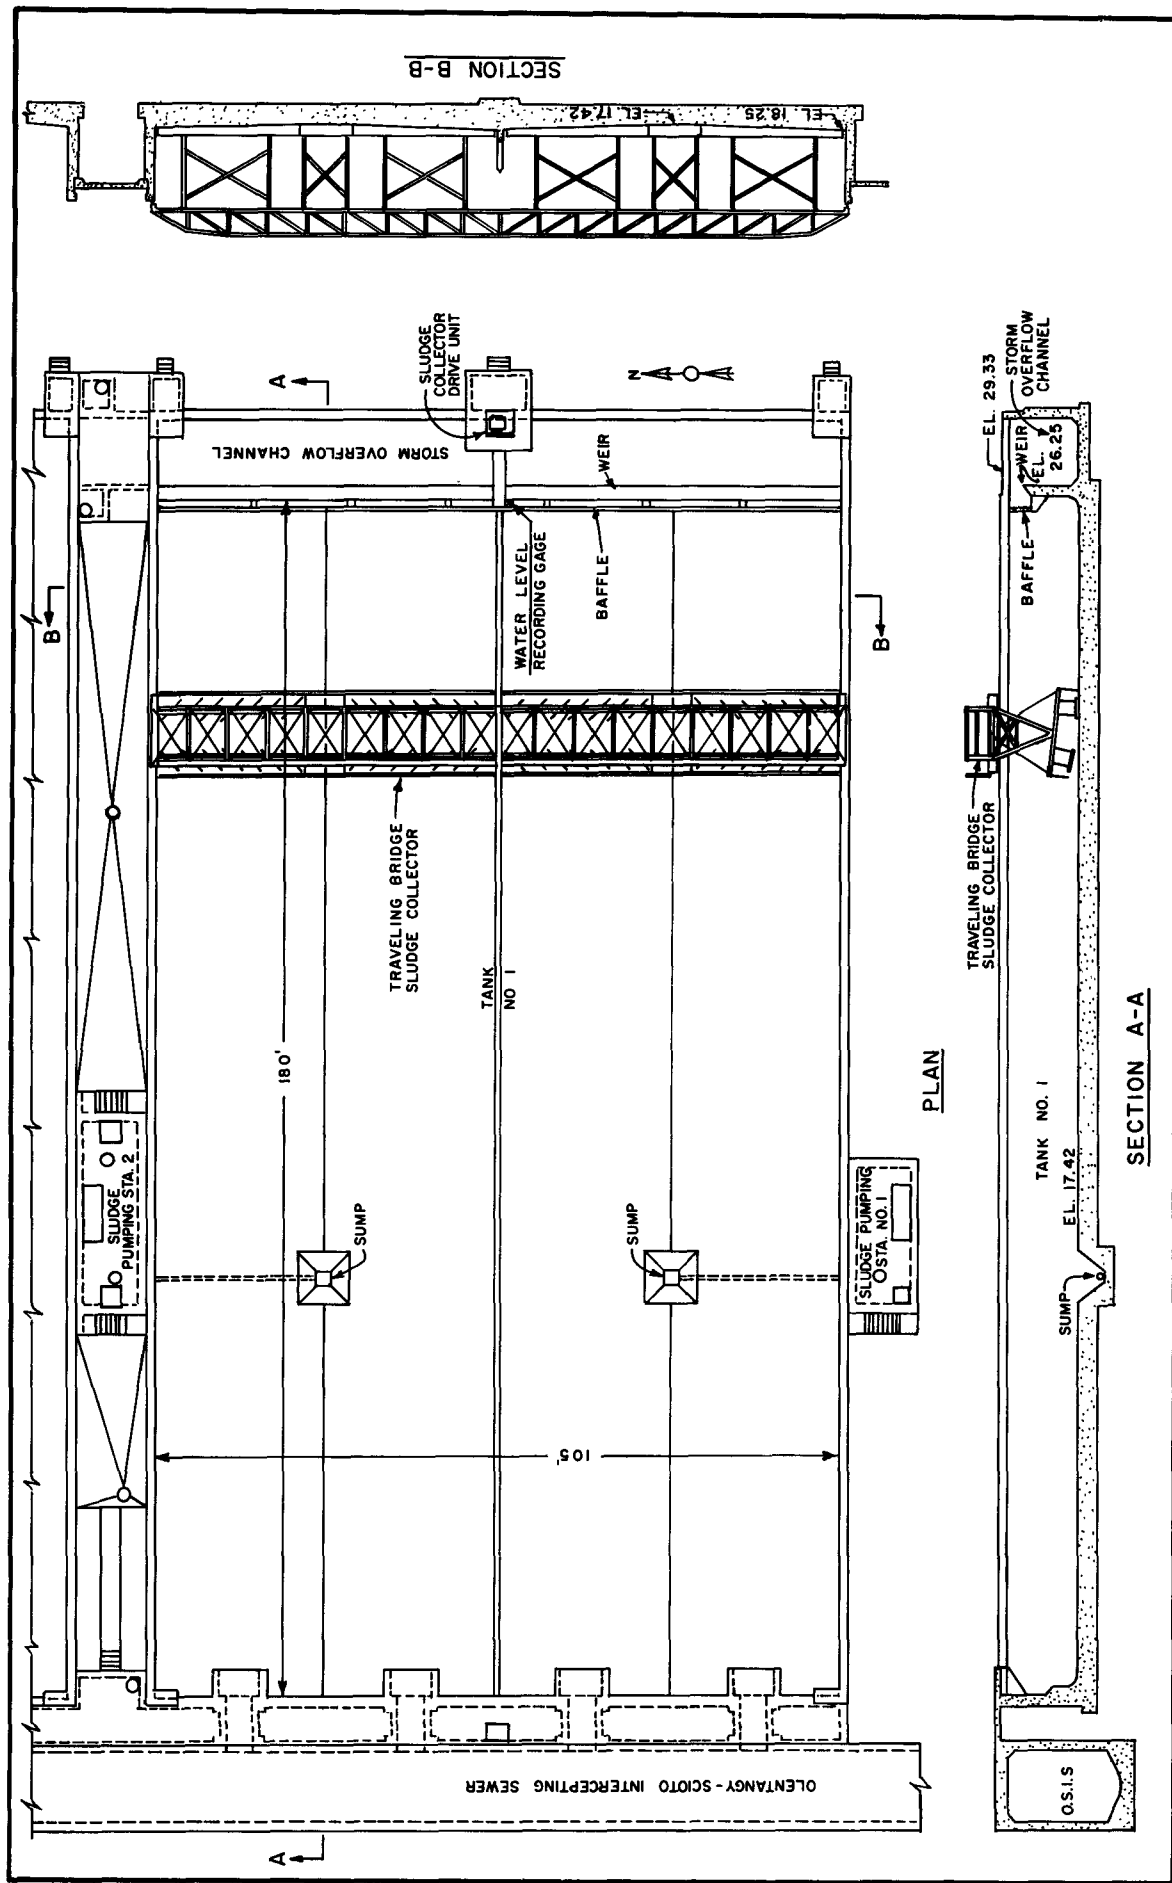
PLAN AND SECTIONS OF MODIFIED TANKS
